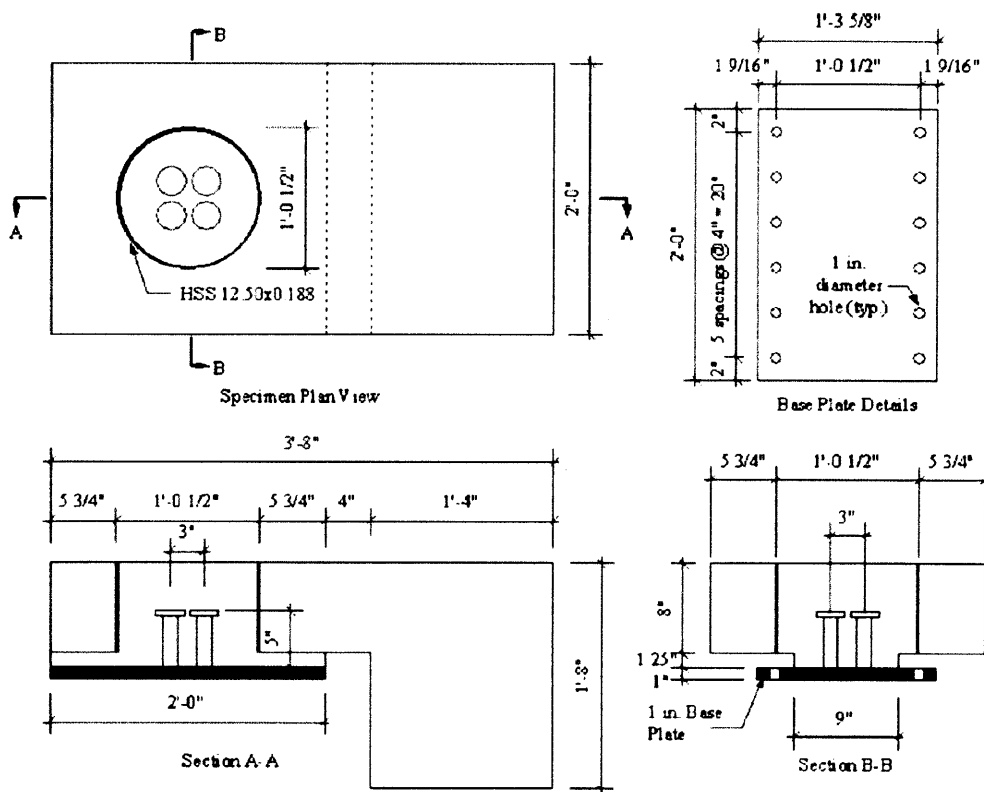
Concrete dimensions of the four-stud steel-tube confinement specimen
